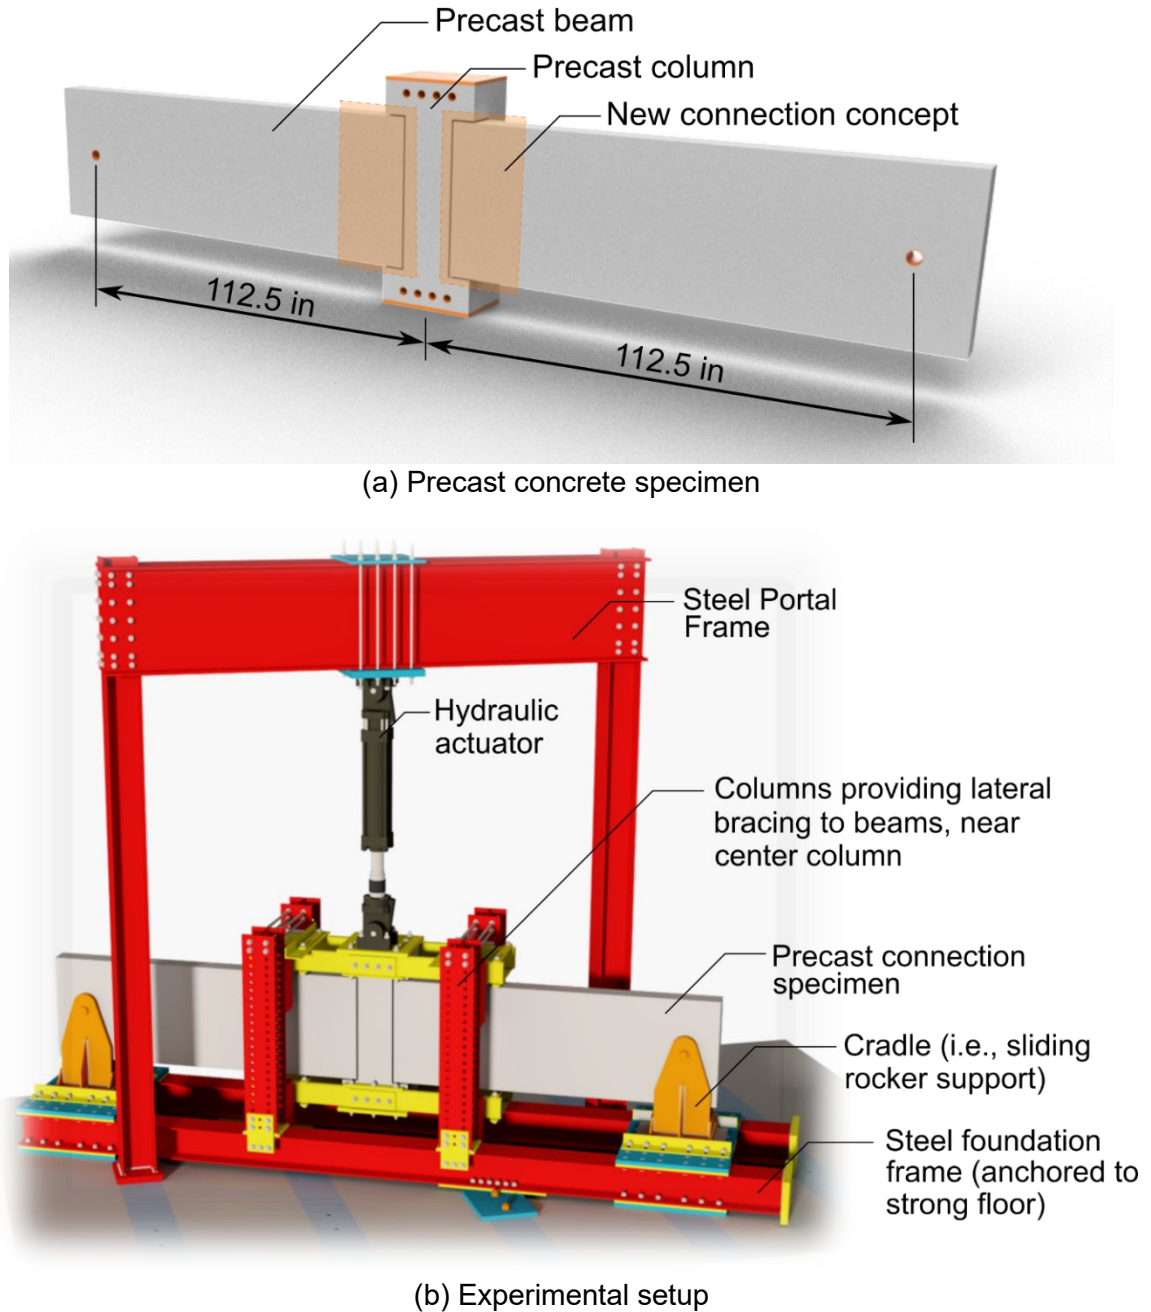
(a) Five-eighths-scale precast concrete subassembly specimen, and (b) experimental setup used to apply vertical loading to center column, while restricting out-of-plane motions
